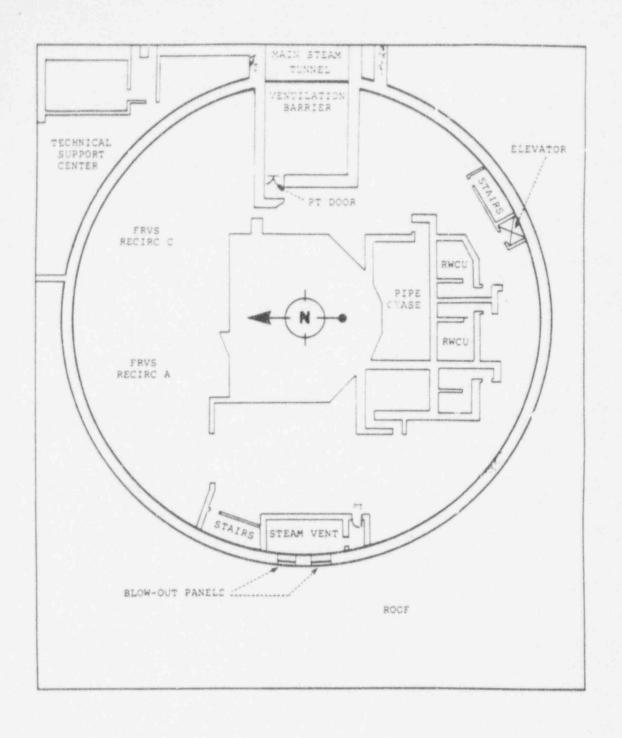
Reactor Building Enclosure Boundary Outline Plan at Elevation 132'-0"
